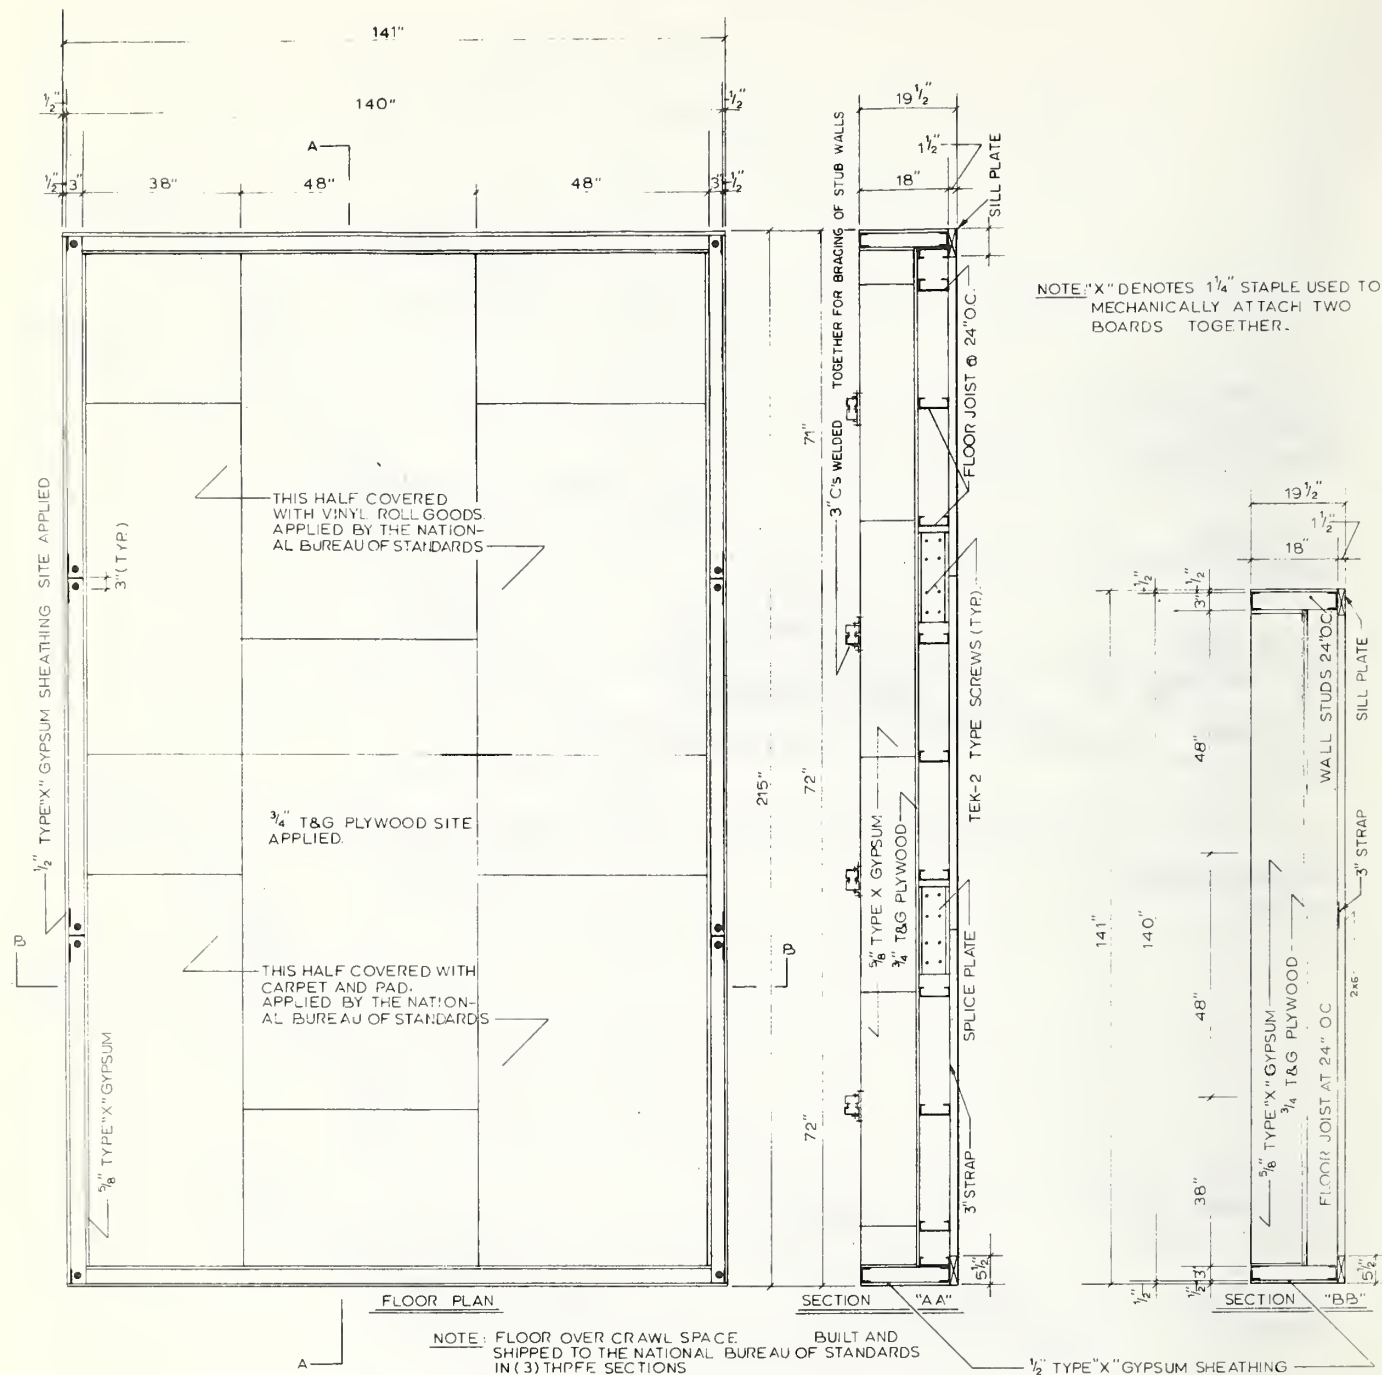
FLOOR OVER FOUNDATION SPACE DETAILS OF CONSTRUCTION
